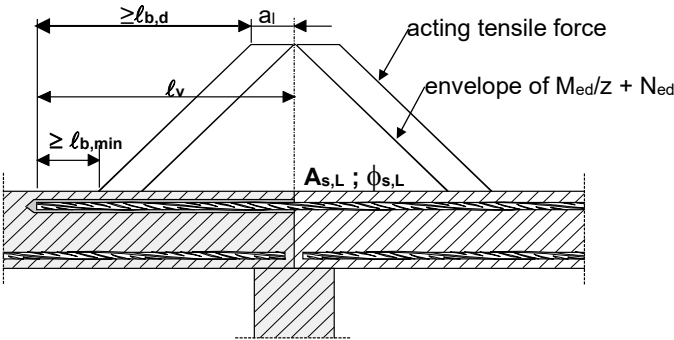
Anchoring of reinforcement to cover the line of acting tensile force
